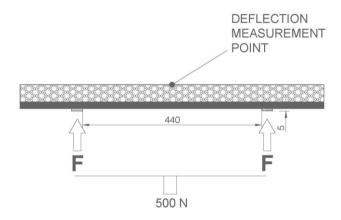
Scheme of resistance to horizontal load test (dimensions in mm). Upper view
